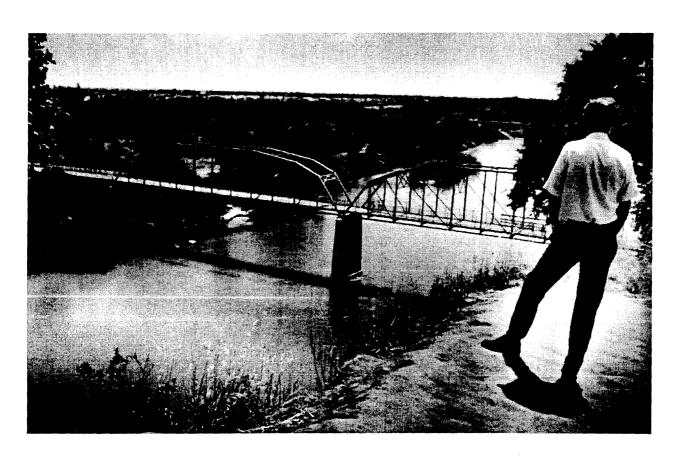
Old Fair Oaks Bridge, view from the northeast looking southwest, June 17, 1983, Sacramento Bee Photo Morgue, accession #SBPM 1105, Sacramento Archives and Museum Collection Center, Sacramento, California.
